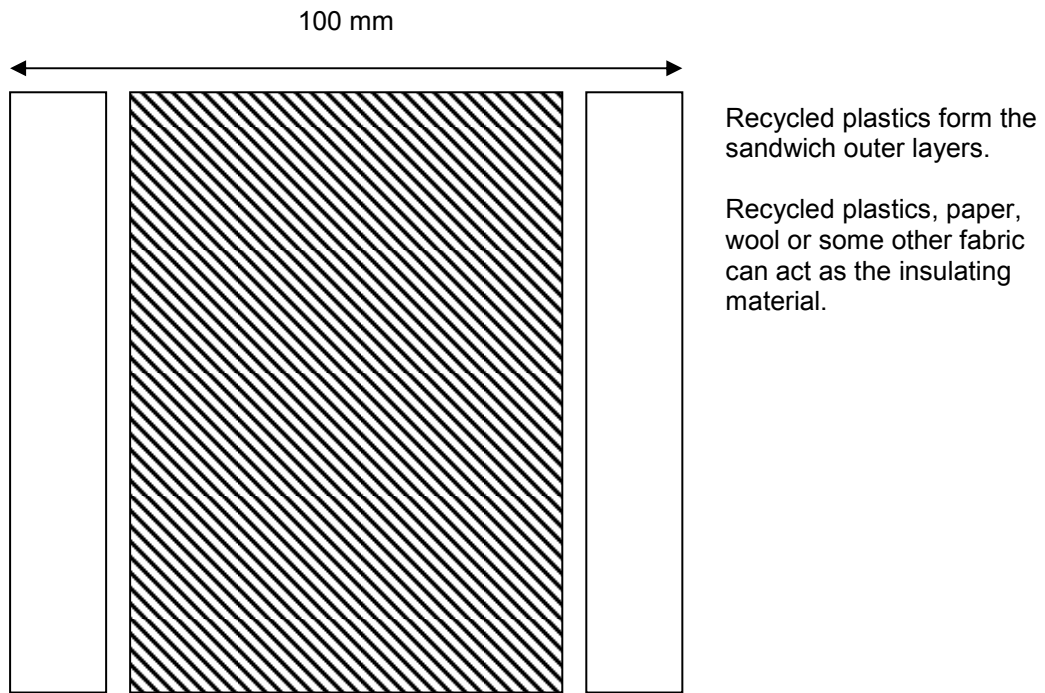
Cross section of the sandwich construction for the walls of the PERUs or PLFs showing the outer recycled plastic layers and the insulating layer.
